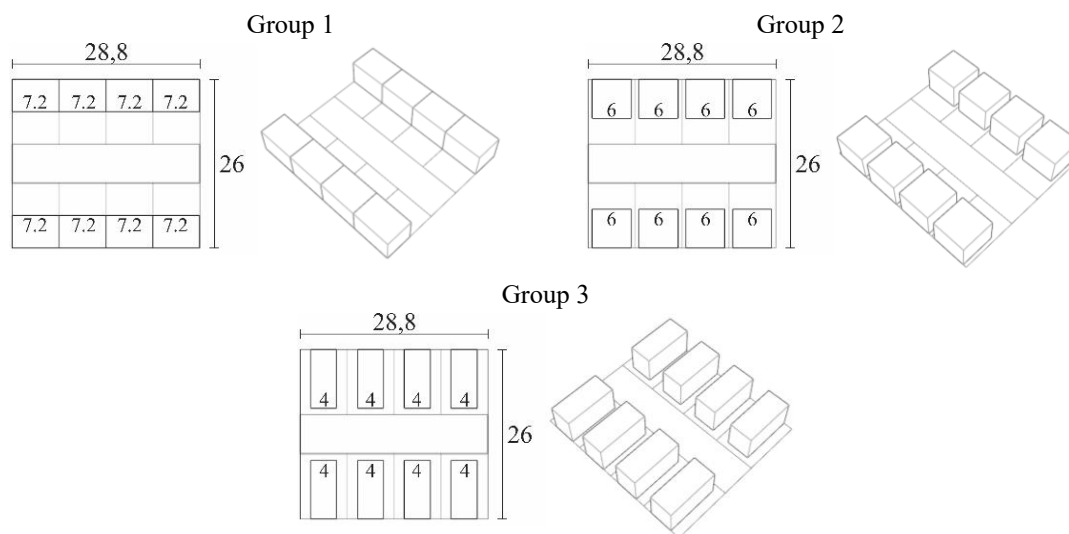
Floor Plan and Perspective of Three Case Study Groups.
